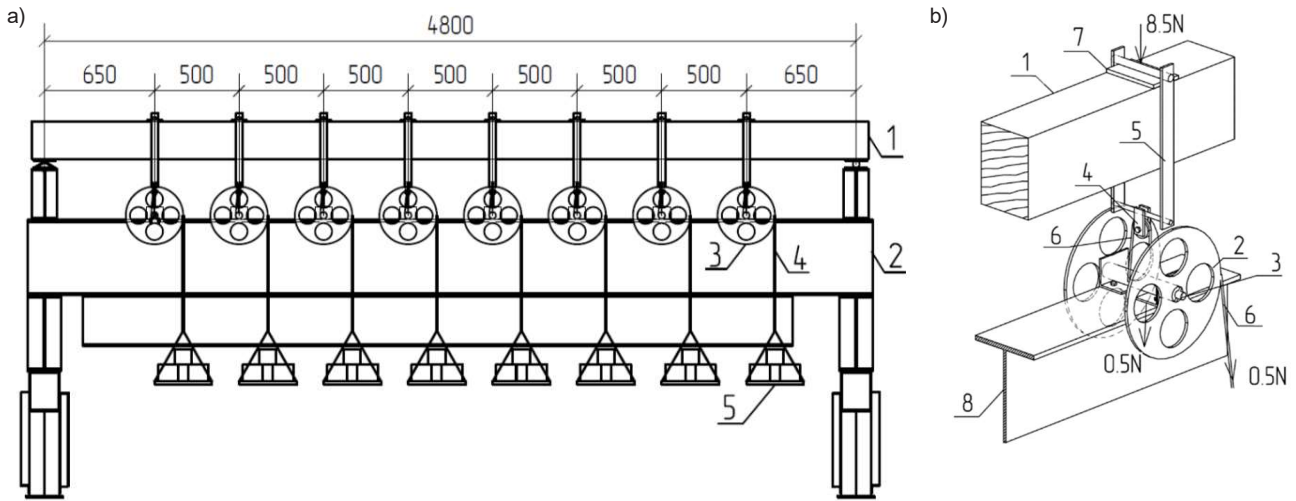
Diagram of the test rig for testing beams with a span of 4.5 m: a) geometric dimensions; b) principle of the shaft/reel operation. (a) 1 — full-scale beam model; 2 — reactive beam: I-beam No. 45 + I-beam No. 30B1; 3 — connection shaft/reel; 4 — steel cables \varnothing 6 mm; 5 — baskets with weights; 6 — dial gauges, 7 — PAO-6 deflection meters to measure rotation angles of support sections, 8 — PAO-6 deflection meter to determine beam deflections. (b) Design of the shaft/reel to transfer loads to the composite beam with conversion ratio $n = 8.5$: 1 — beam; 2 — connection reel \varnothing 340 mm; 3 — connection shaft \varnothing 40 mm; 4 — single block for cable \varnothing 50 mm; 5 — rod made of rolled plate $\delta = 5$ mm; 6 — steel cables \varnothing 6 mm; 7 — distributing plate $\delta = 16$ mm; 8 — reactive beam: I-beam No. 45 + I-beam No. 30B1)
